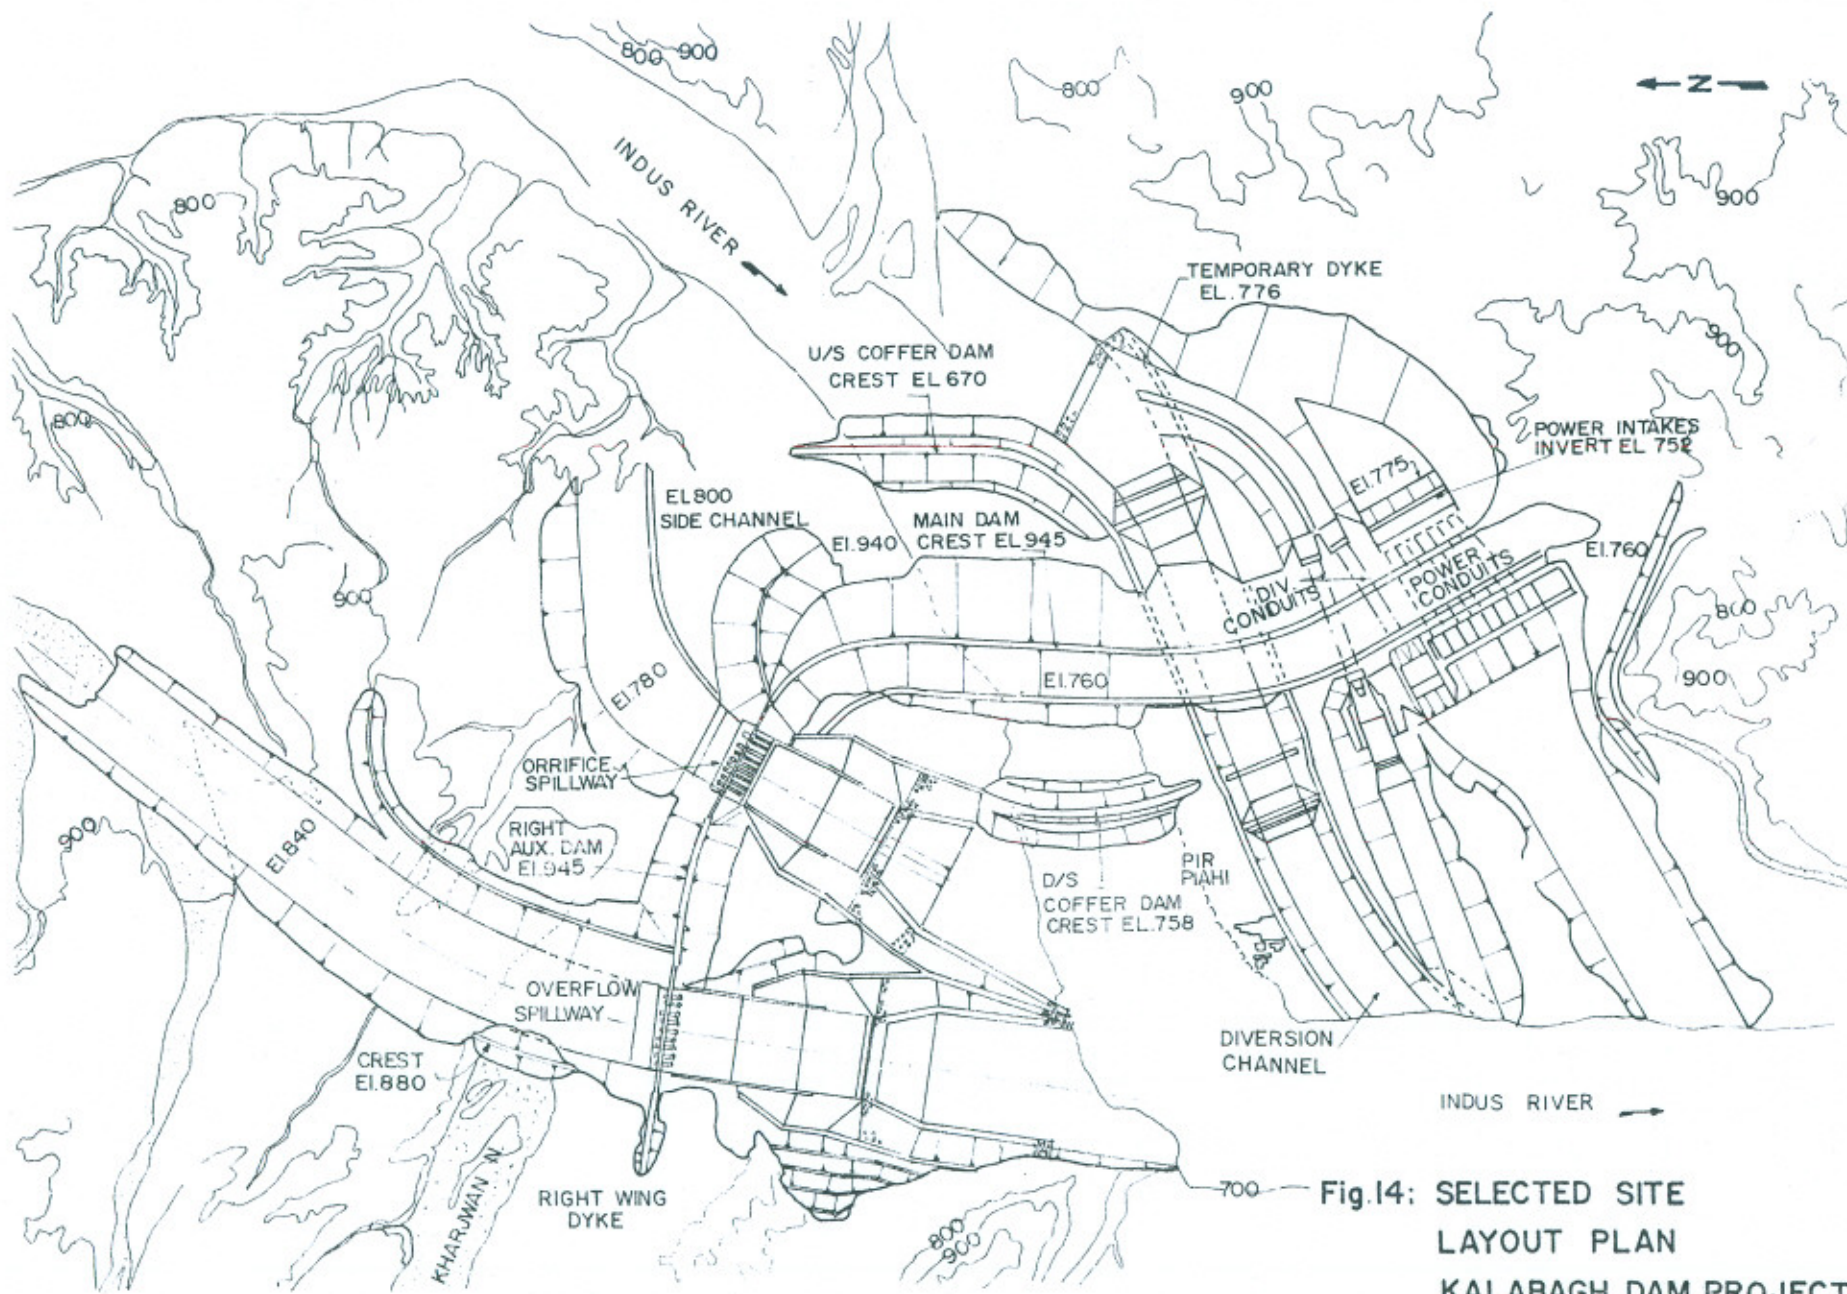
SELECTED SITE LAYOUT PLAN KALABAGH DAM PROJECT
